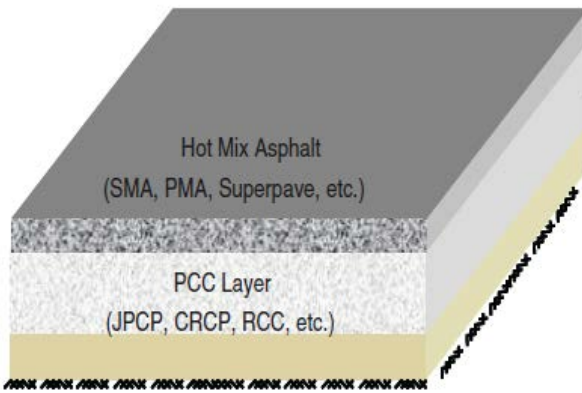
Cross section of asphalt-surfaced composite pavement (Rao et al., 2013a, p. 15)
